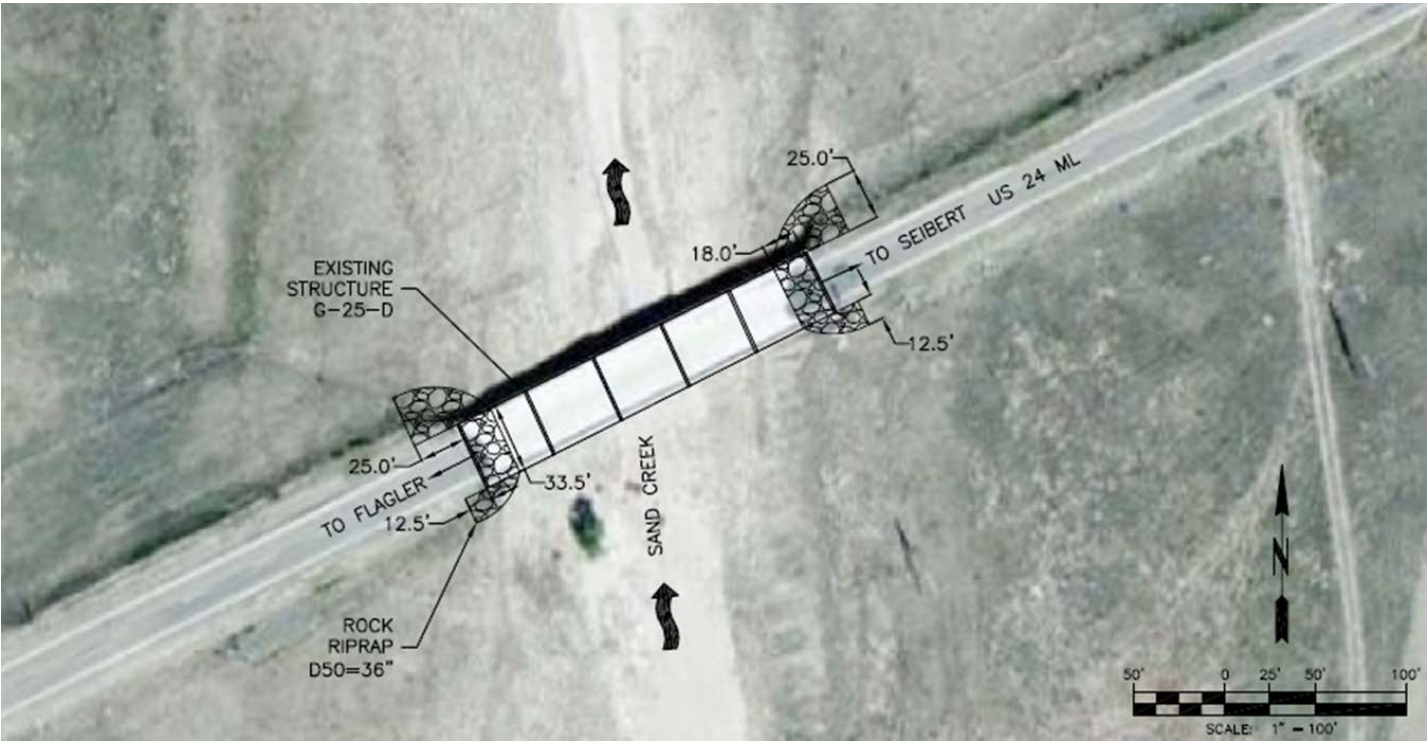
Plan view of Bridge G-25-D with recommended hydraulic scour countermeasure locations
